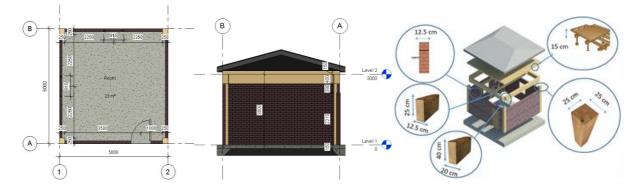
Case study- III: architectural plan (left), section (middle), structural system details of timber-framed structure (right).
